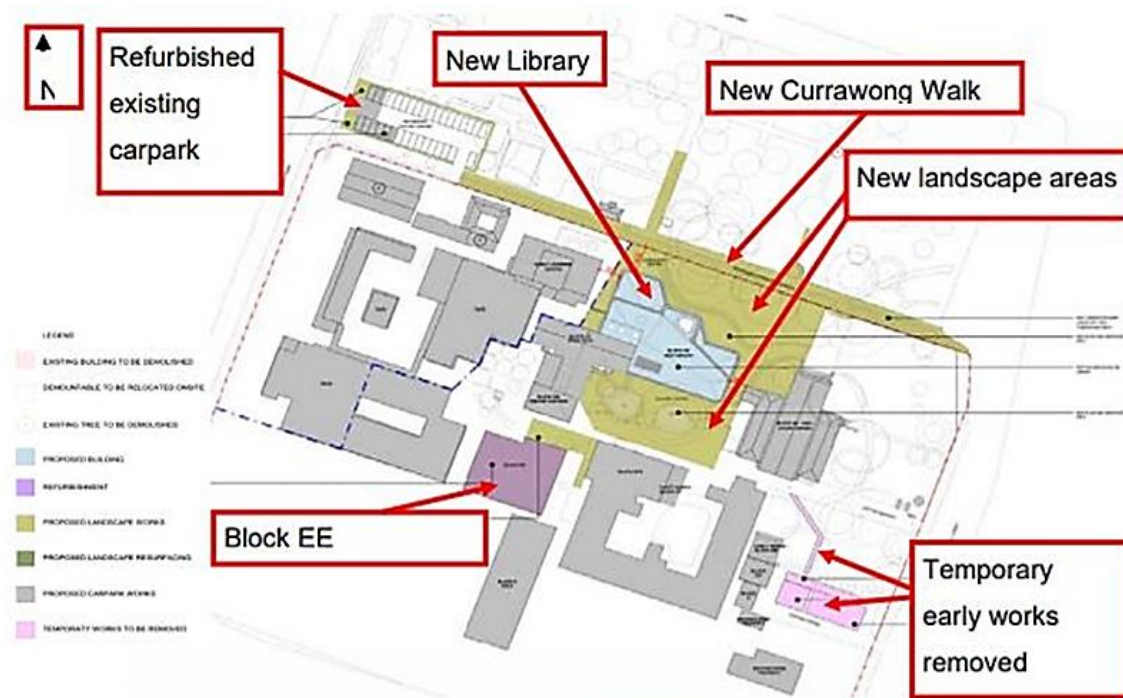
Proposed site layout (Young High School Library and Joint Community Facility EIS, 2019)
